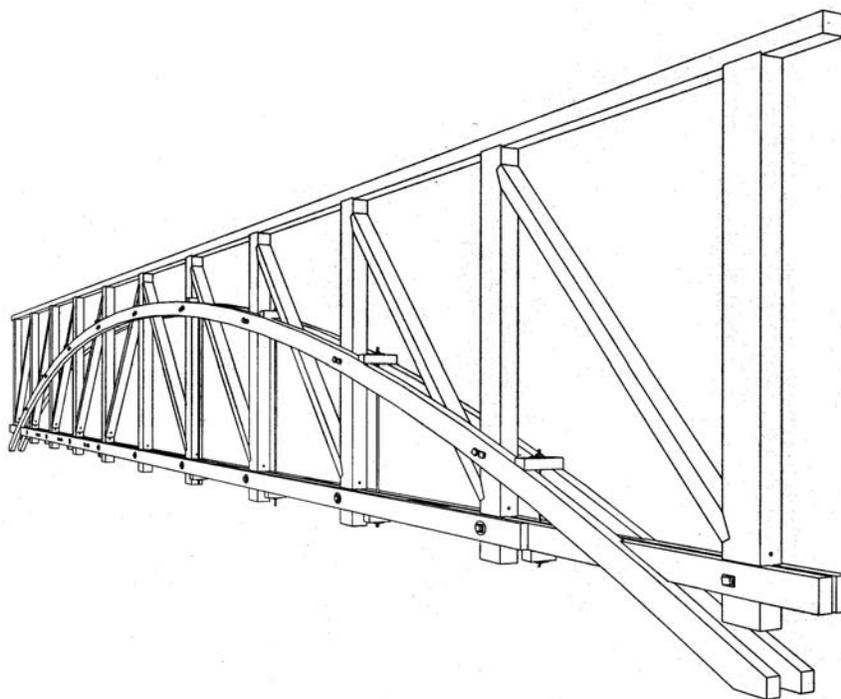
Pictorial View of the Burr arch-truss at Pine Grove.<sup>1</sup>
